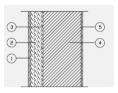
Exterior Insulation Finishing System (EIFS), 1 finishing plaster on reinforced ground, 2 PUR heat insulation 3 fixing mortar, 4 exterior wall, 5 interior plaster.
